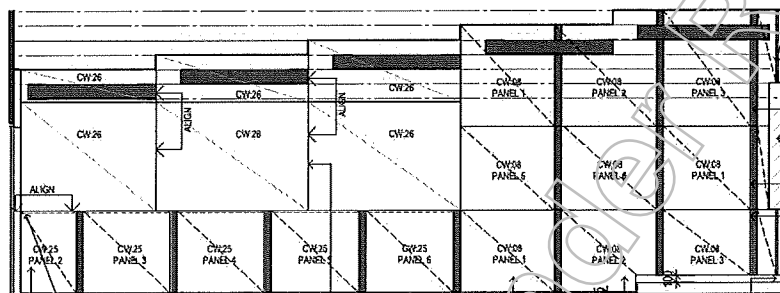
Briefing Room elevation (1:100) – Part plan ID-4426[5]
